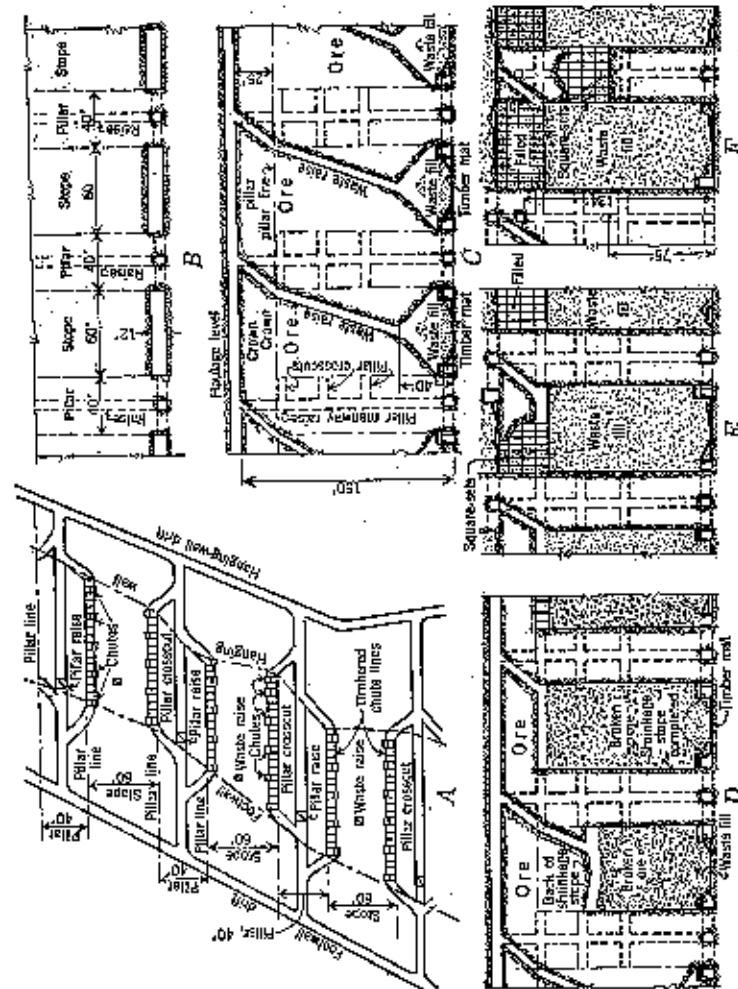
Shrinkage stoping, Homestake mine, South Dakota: A, Sill floor plan showing part of a level, pillars, and chute lines; B, vertical section showing stope shrinkage; C, vertical section showing shrinkage stoping; D, vertical section through shrinkage stoping; E, shrinkage stoping mined and filled, crown pillars being mined by square-setting; F, mining stope pillar by square-setting.
